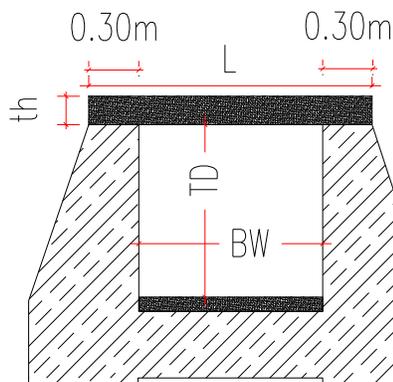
Typical Cross Section of the main canal at Foot Path Crossing
